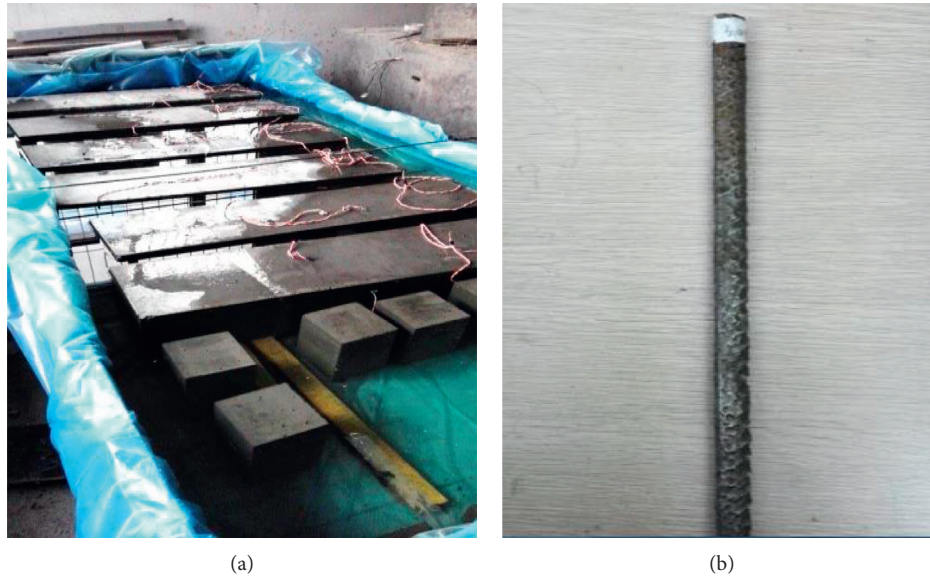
Corrosion test. (a) Layout of corrosion test. (b) Corrosion of steel bar.
